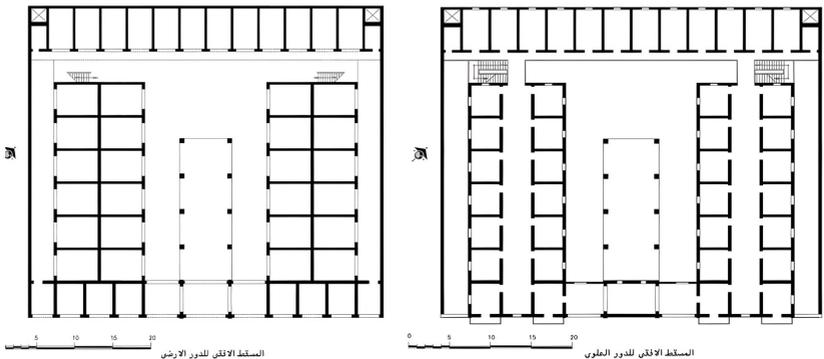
Example of plans used at project inception to guide the documentation and work plan. (Source: Badr, 2018)
